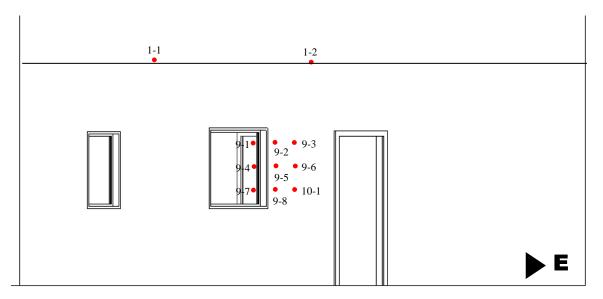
TC on N wall balloon frame and TC tree hanging out on west of LBR window
